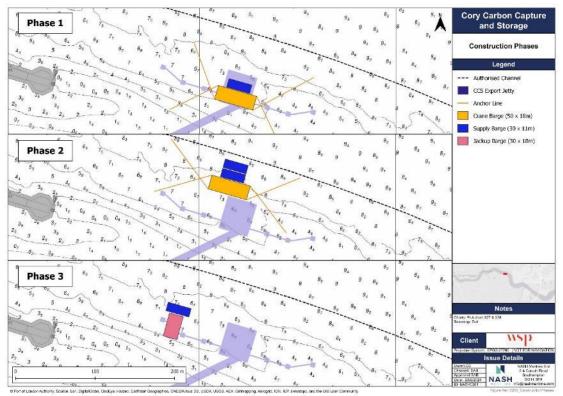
Indicative Barge Mooring Layouts and Anchor Spread.
